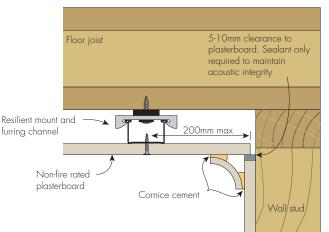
Ceiling to Wall Resilient mount and furring channel
